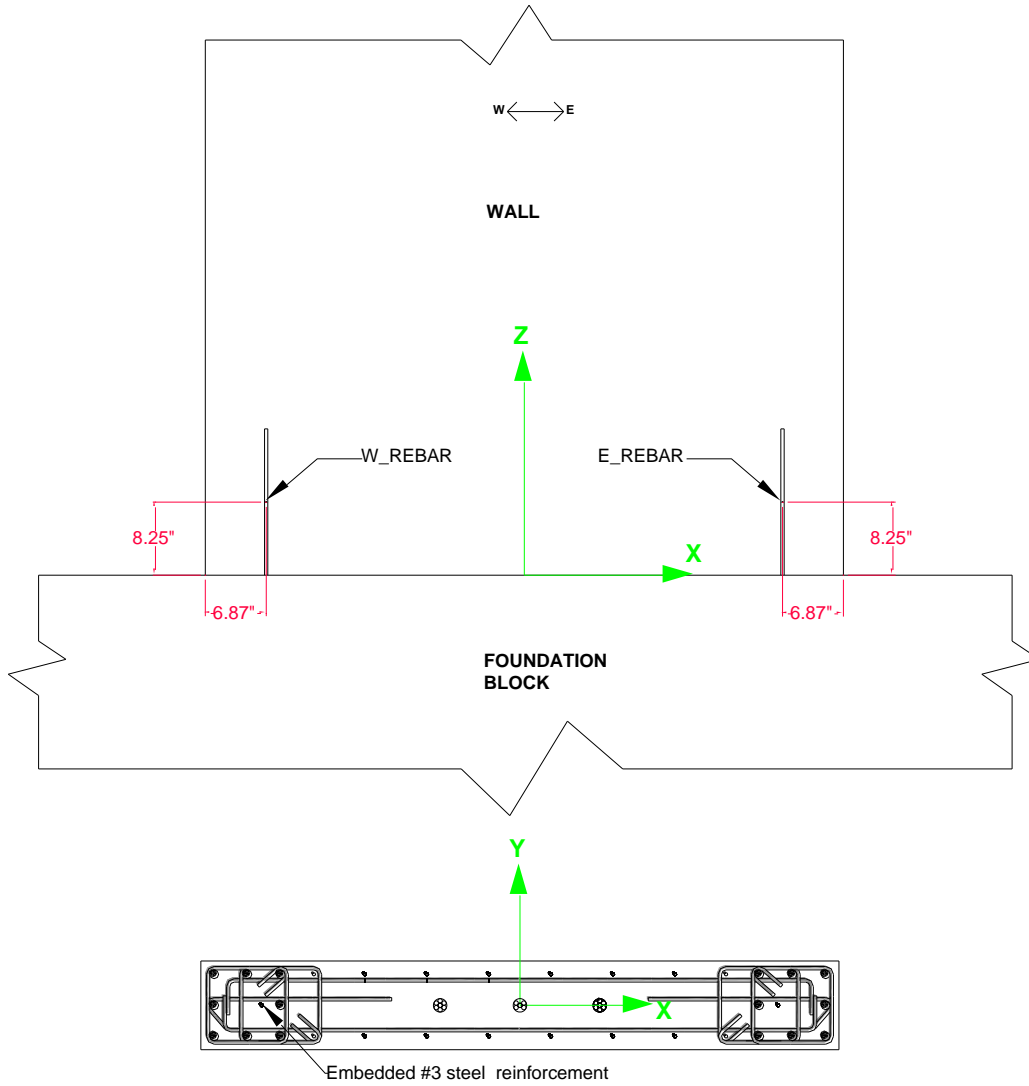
Embedded strain gauges in confined concrete on Wall 2
